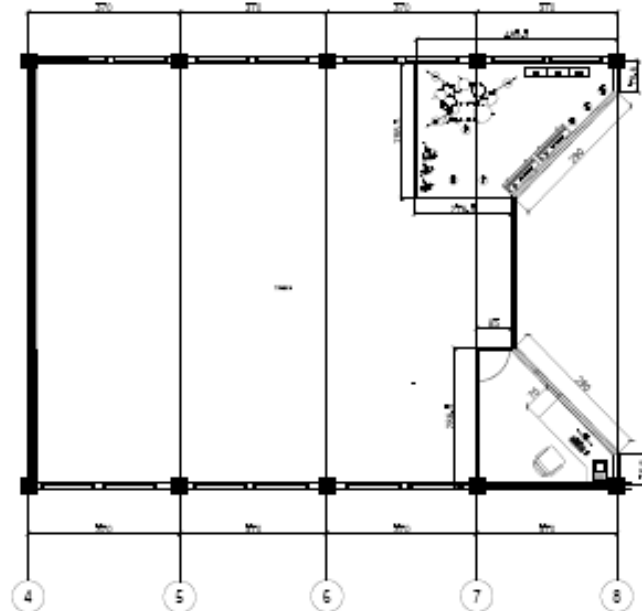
2D Sketch for the Second-Floor Tribune of HKBP Church Building
